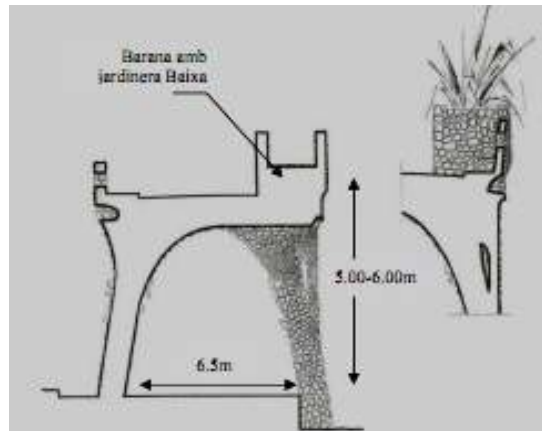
Section of the lower viaduct and detail of the jardiniere of the deck of the bridge
